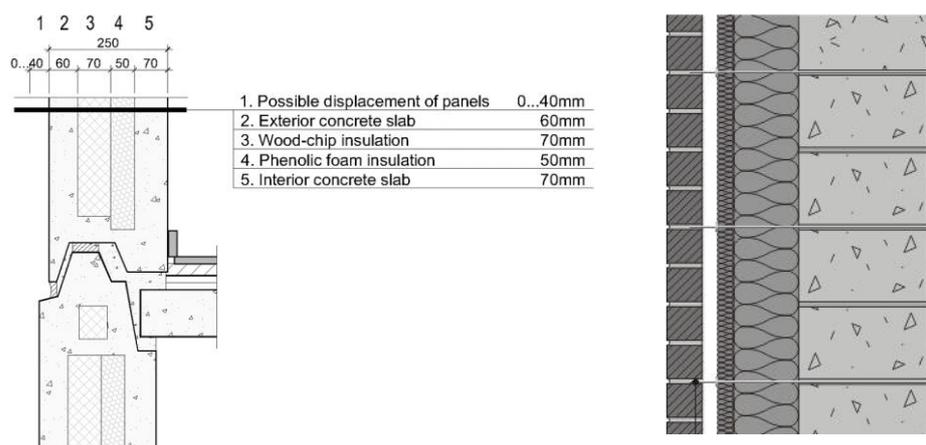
Wall structure in typical buildings in Estonia as used for the MORE-CONNECT pilot, for buildings built before 1990s (left), and after 1990s (right)
